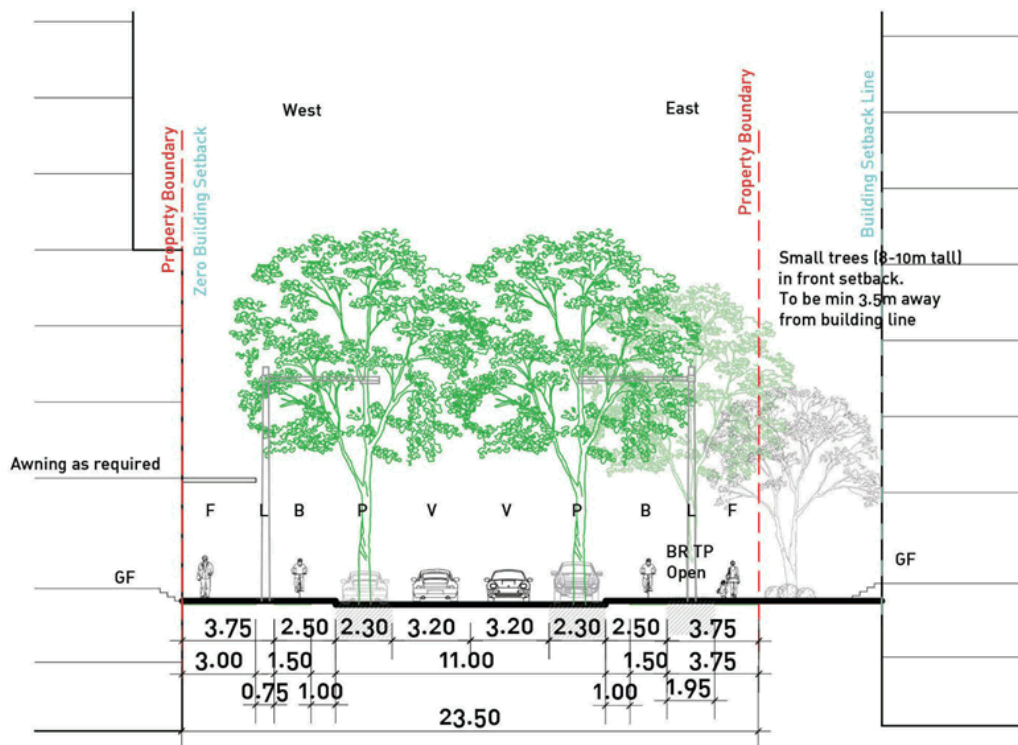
Type 2C Main Road with Cycle Tracks Town Centre Interface (NSR 3)
